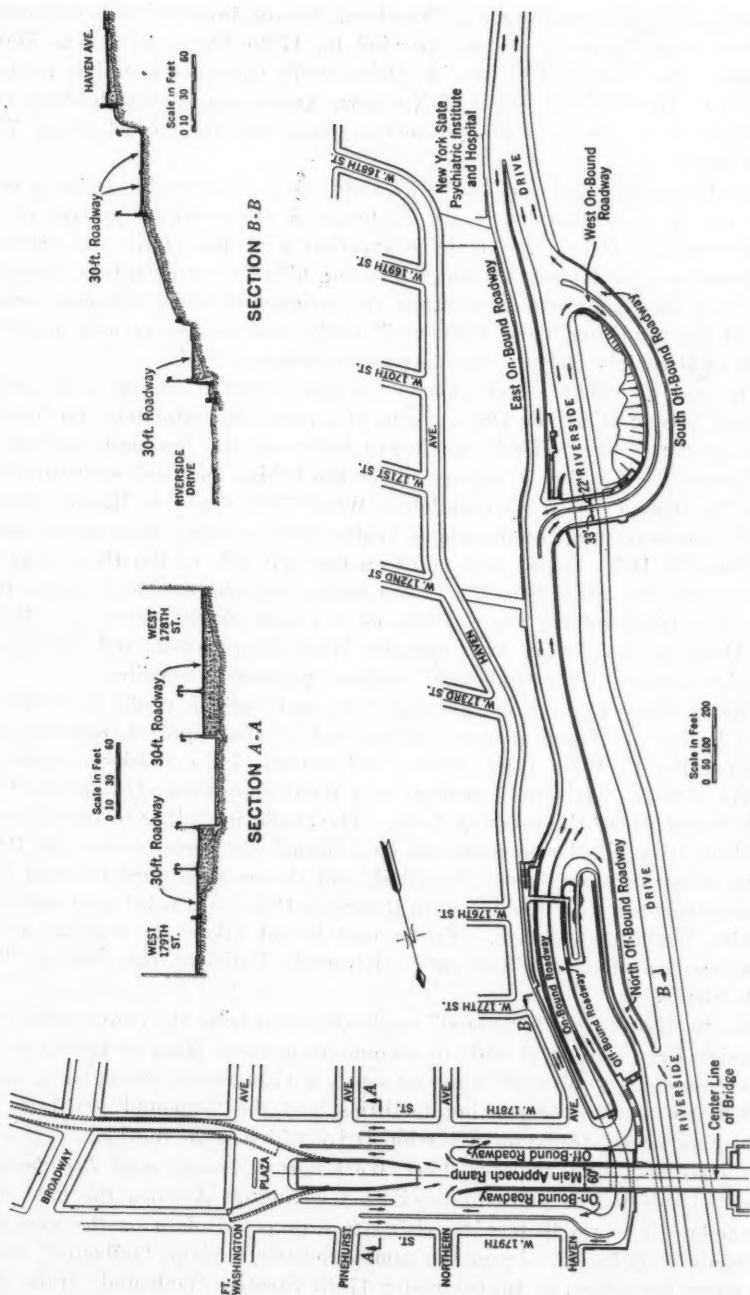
NEW YORK APPROACH, INITIAL CONDITION, INCLUDING RIVERSIDE DRIVE CONNECTIONS.
